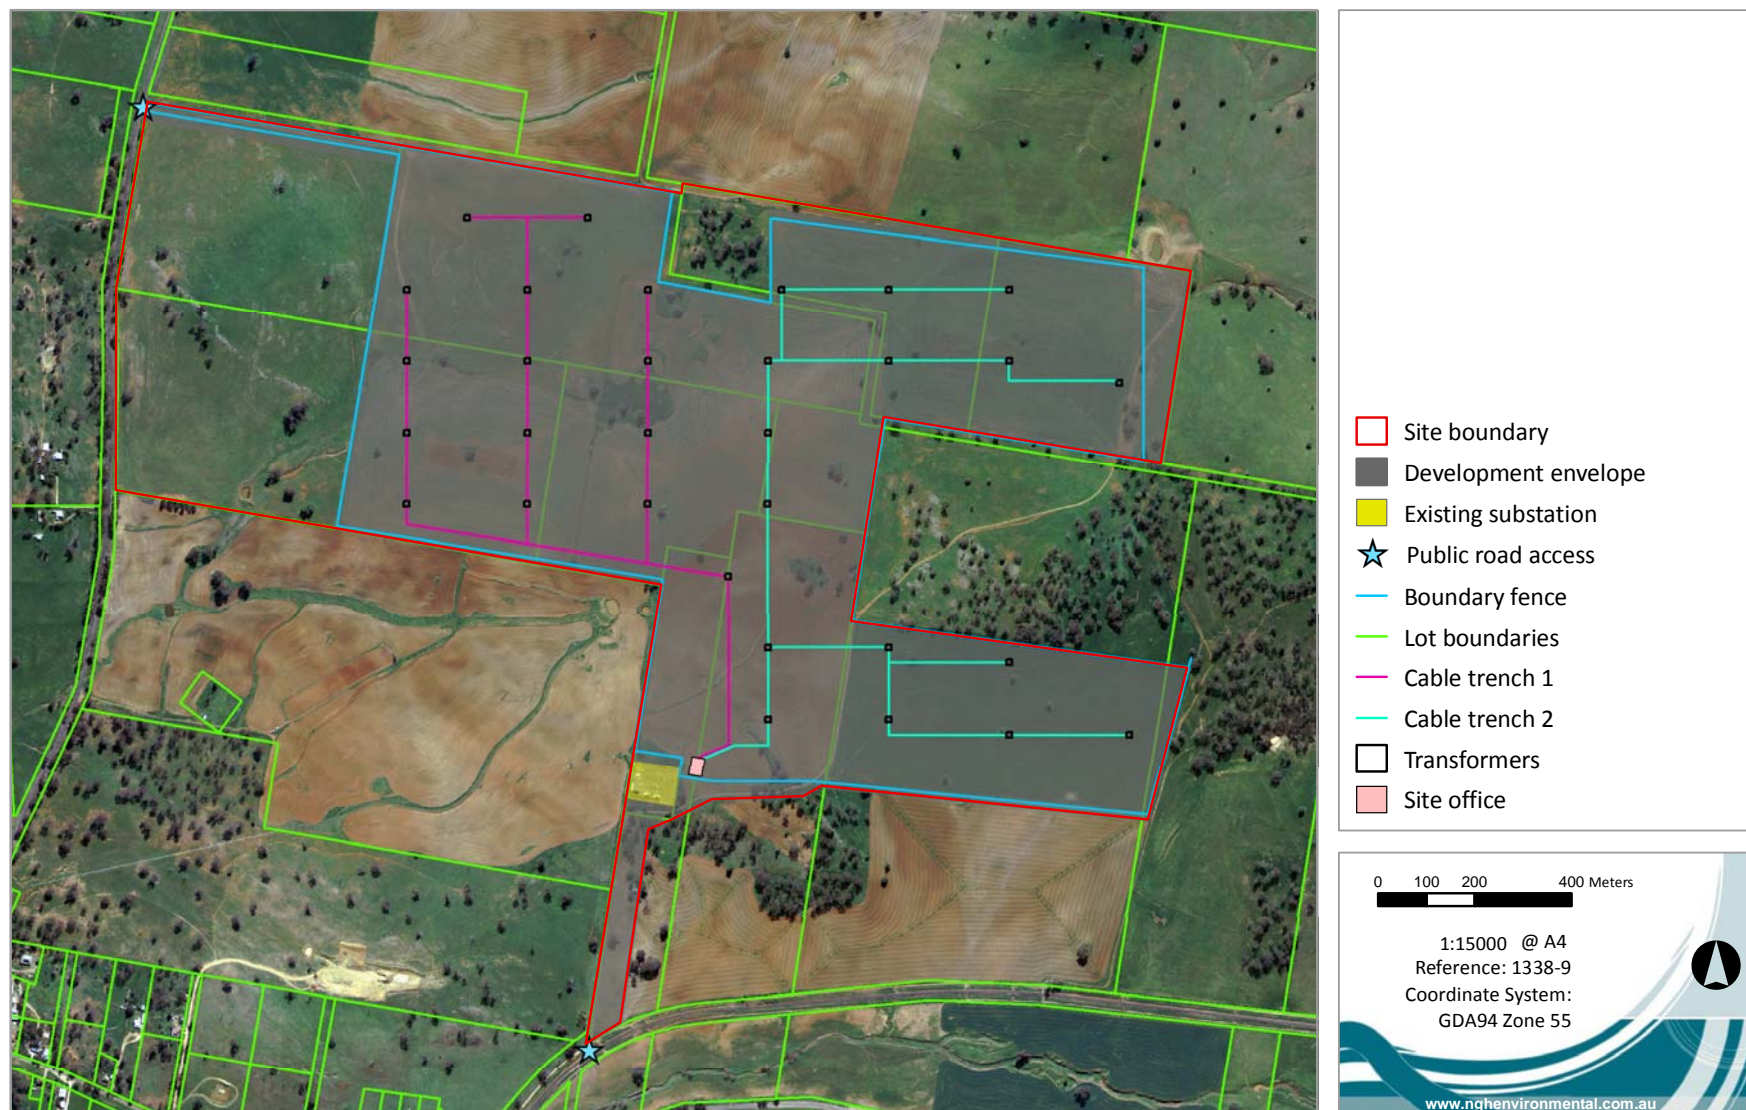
Proposed Manildra Solar Farm layout, View 2: Cadastral boundaries, cable trenches and fencing
